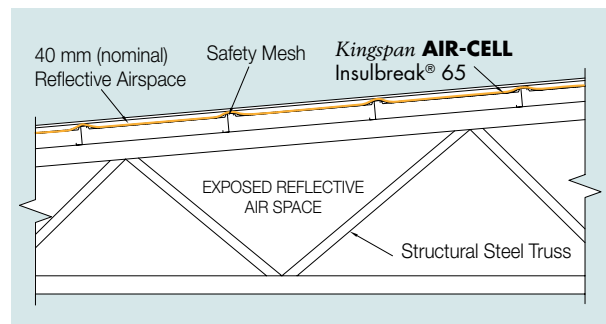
Side elevation of Kingspan AIR-CELL Insulbreak® 65 in a commercial warehouse
